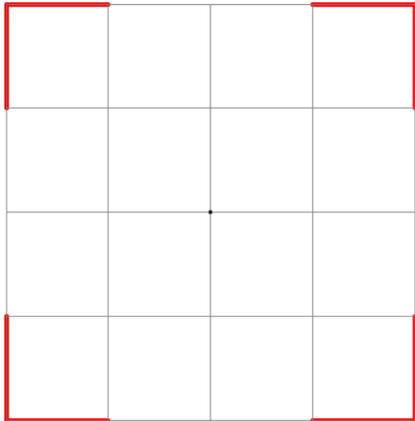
(a) Structural Plan for V-braced RC Frame (Model-7)
